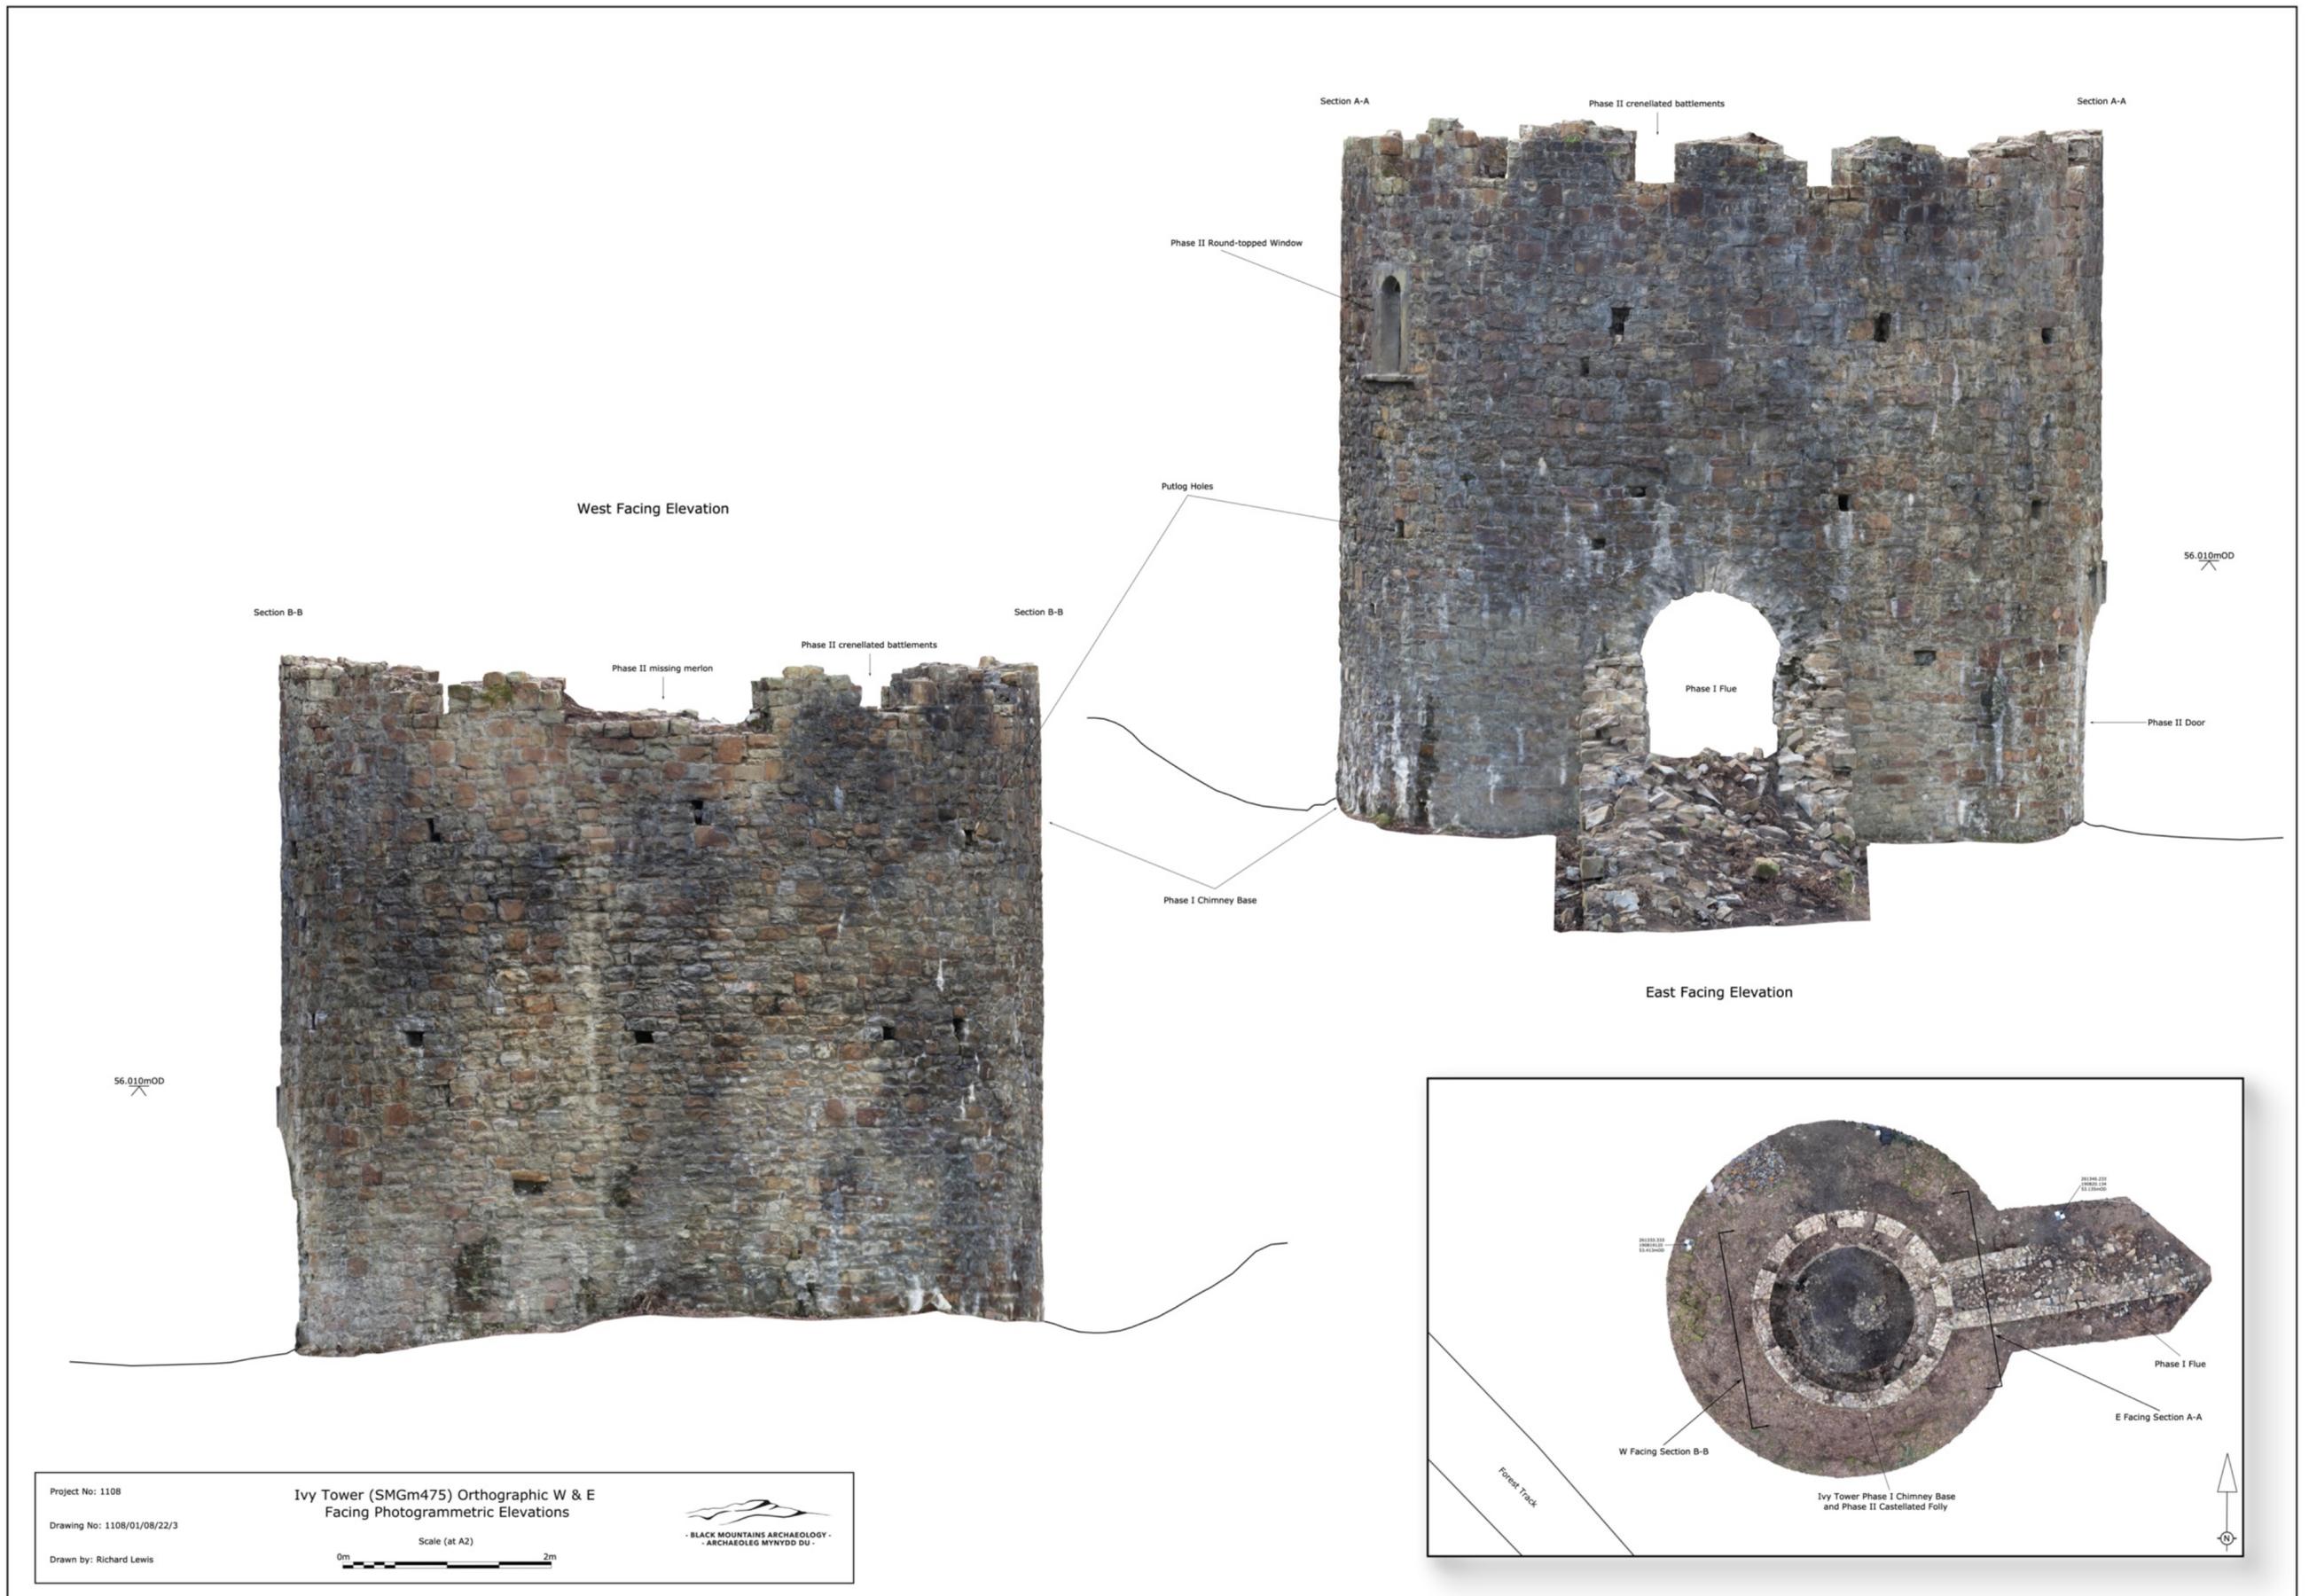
Ivy Tower Orthographic West and East Facing Photogrammetric Elevations.
